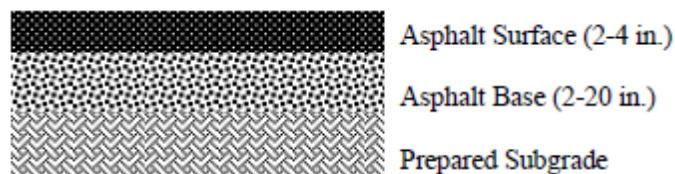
Typical Cross Section of Asphalt Pavement (Huang, 2004)
